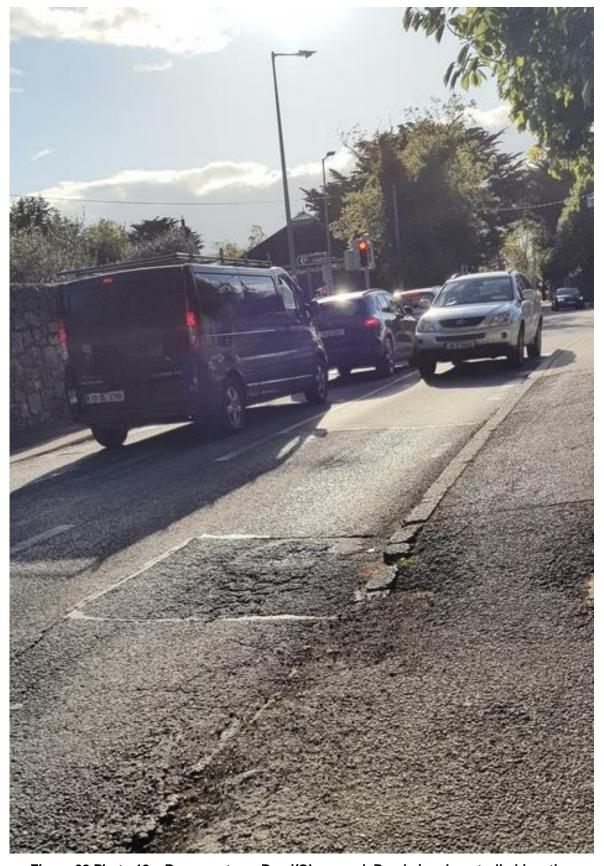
Photo 12 - Brennanstown Road/Glenamuck Road signal-controlled junction
